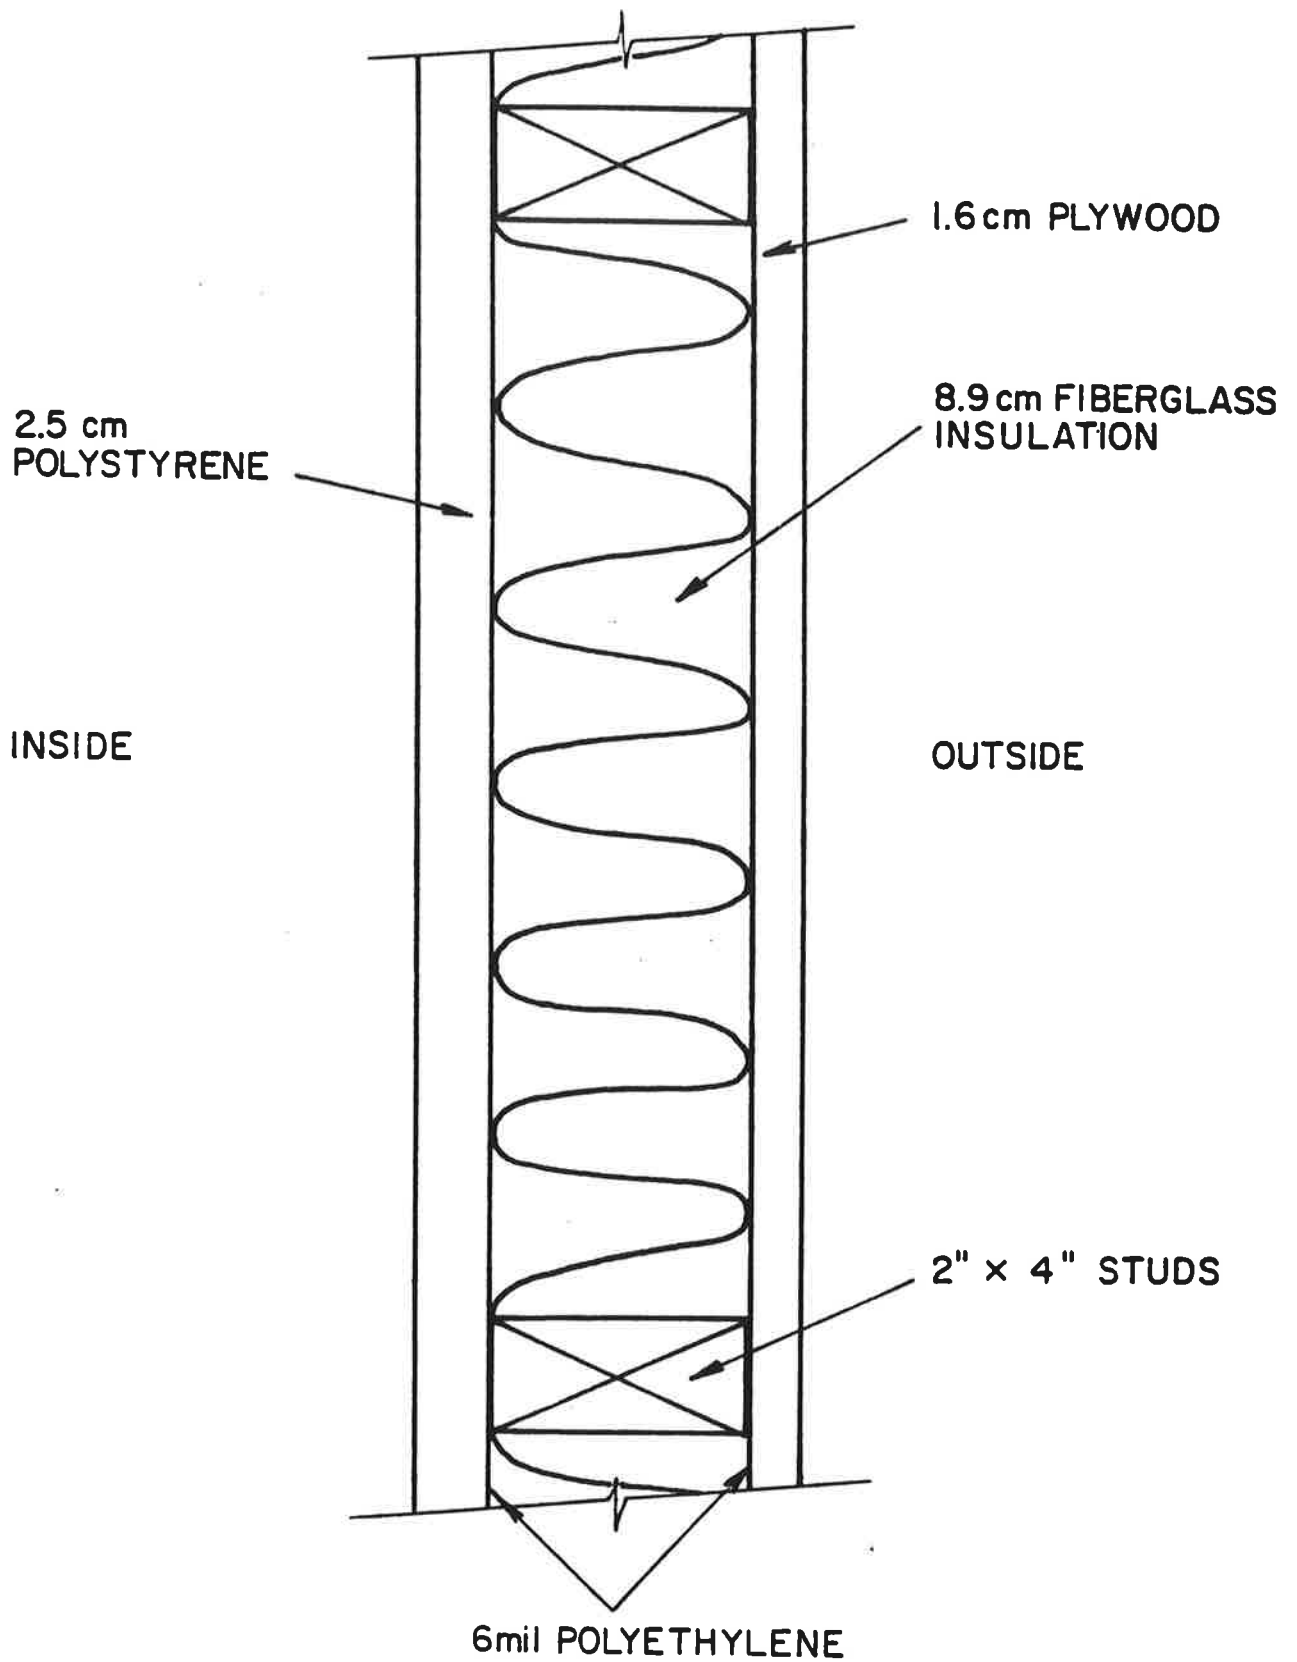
TYPICAL WALL SECTION, TOP VIEW
